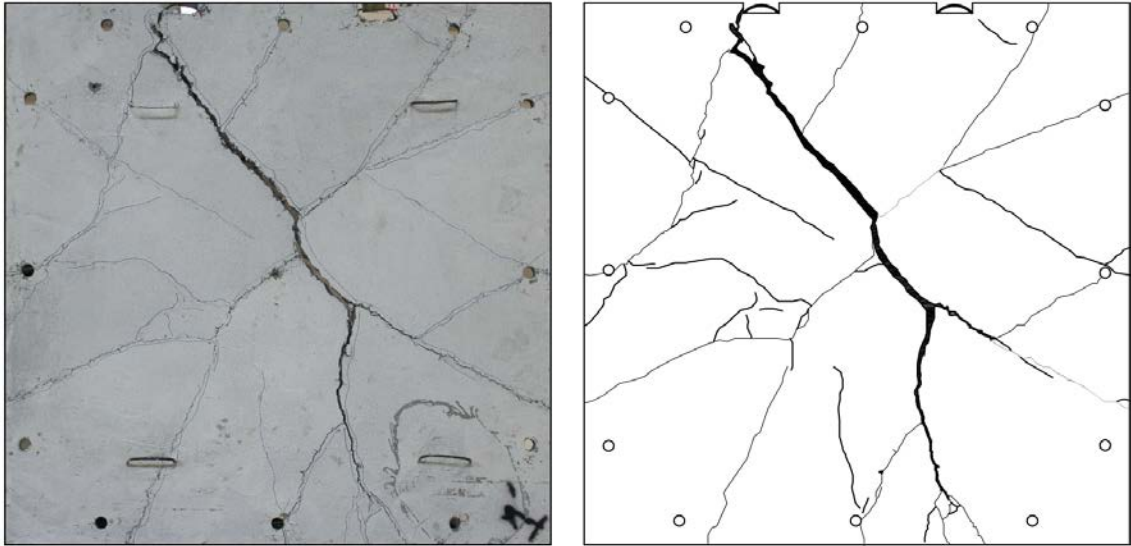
Front Face Crack Patterns After Testing for Panel JA1-075+PVA
